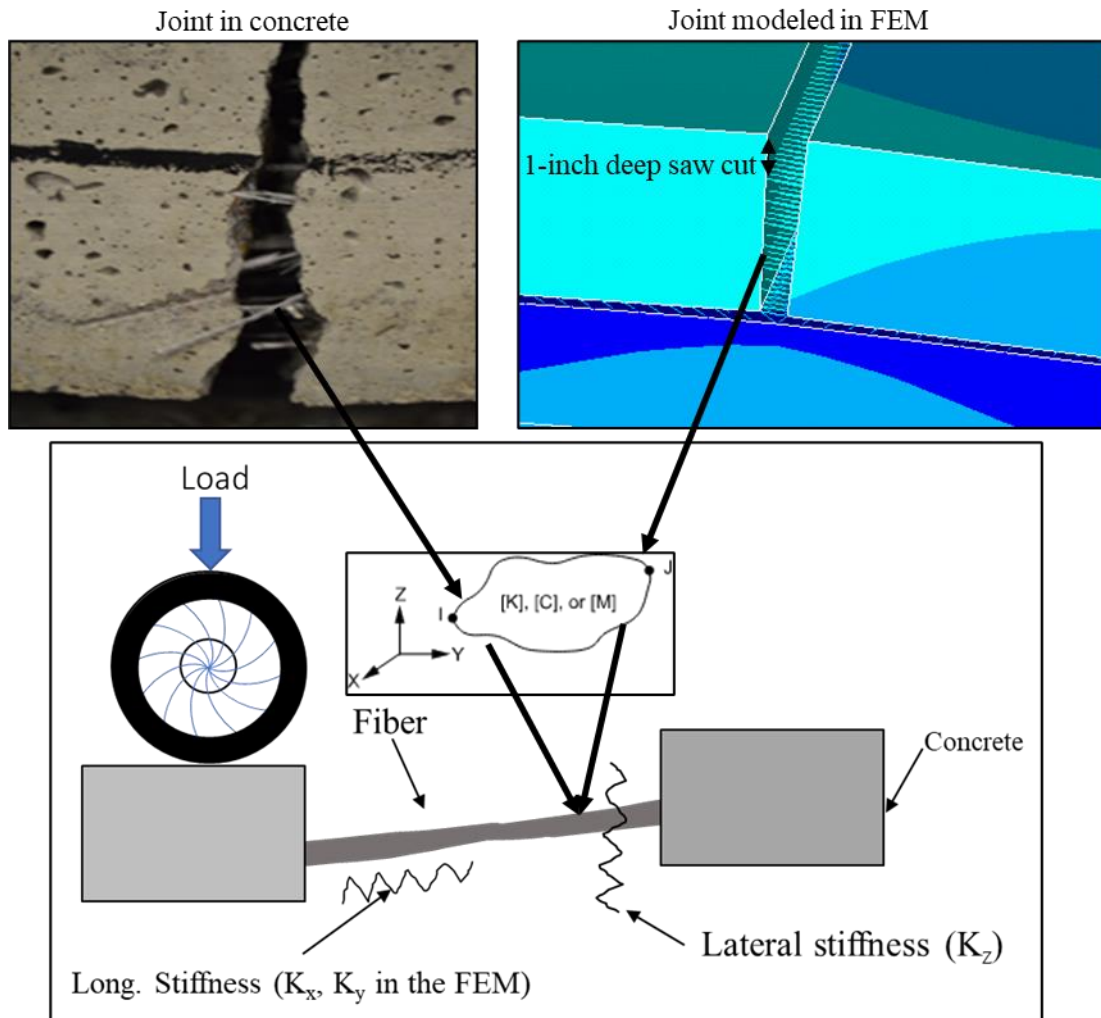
Slab-to-slab joint modeling for the FRC thin pavements.
